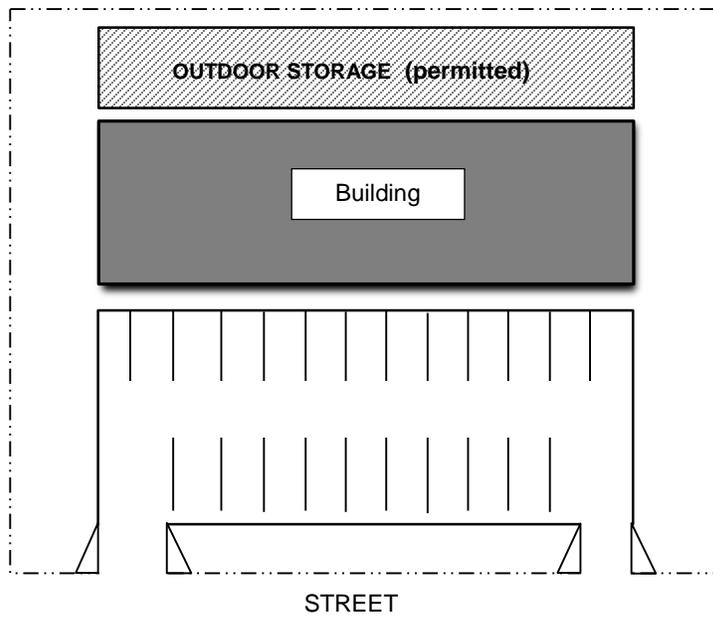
INTERIOR LOT WITH FRONT PARKING
